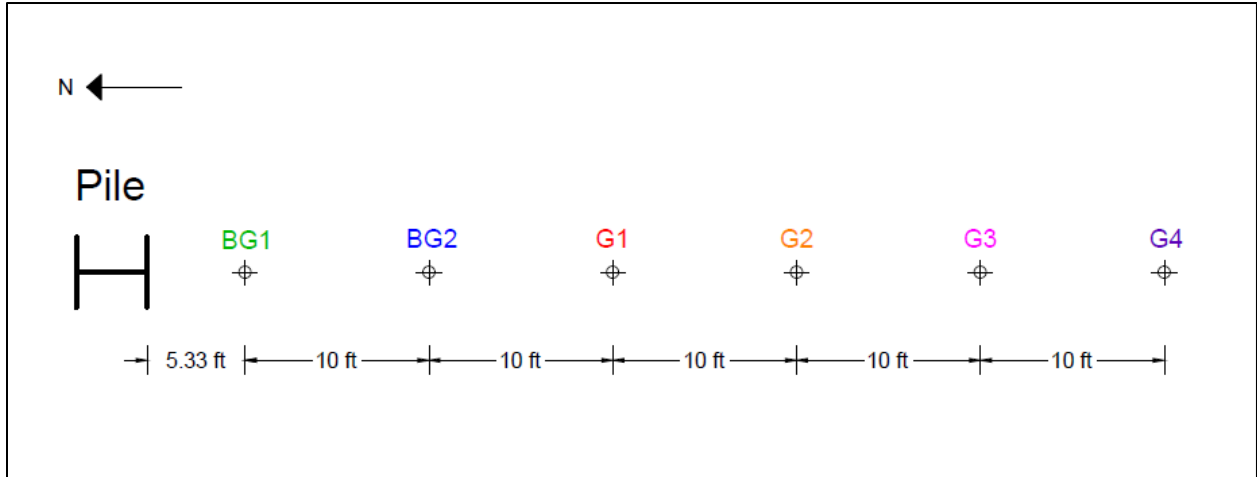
Plan view of ground surface array of geophones at M-66 site
